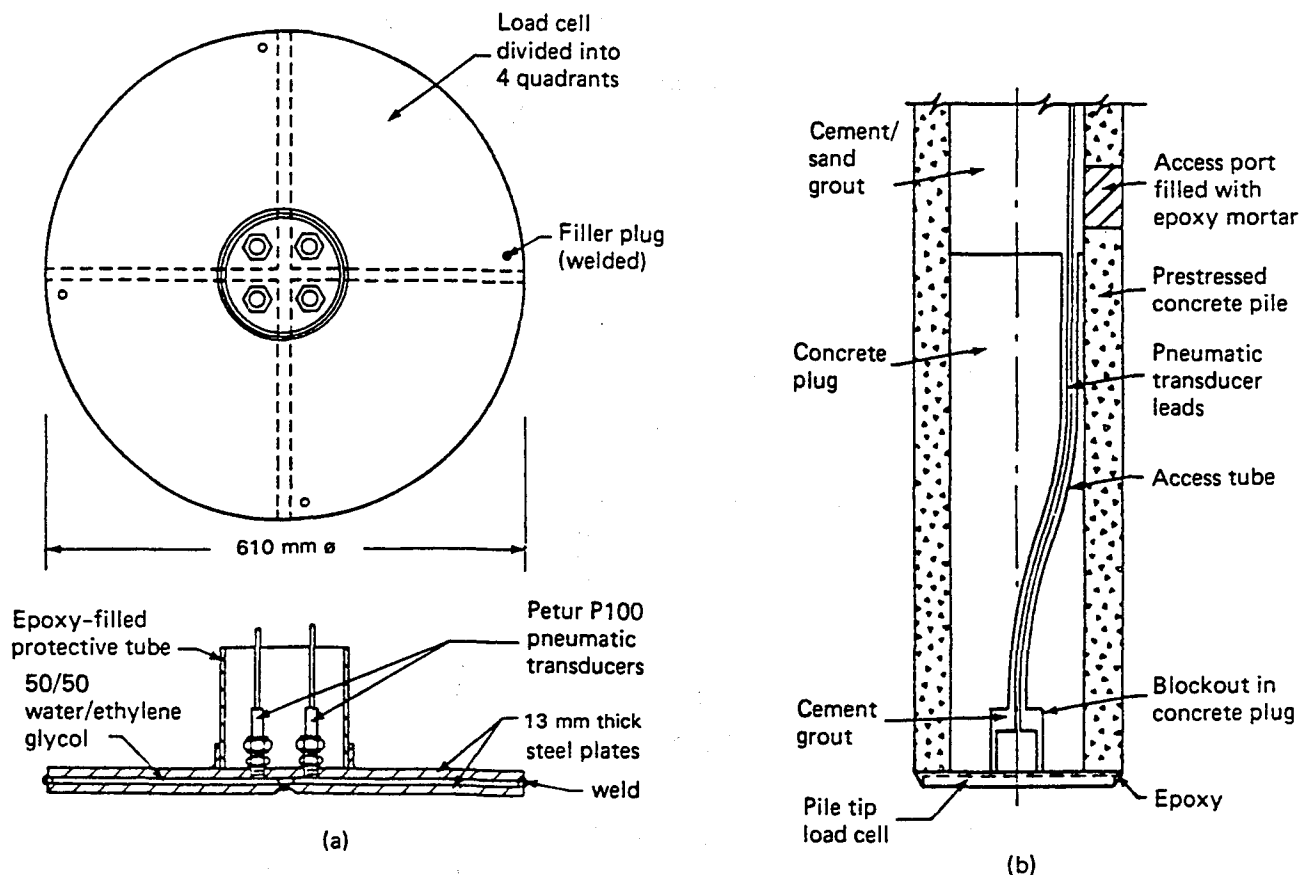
Contact Earth Pressure Cell for Measurement of Pile Toe Load: (a) Construction Details of Cell and (b) Cell Mounted on Pile. (After Green et al., 1983)
